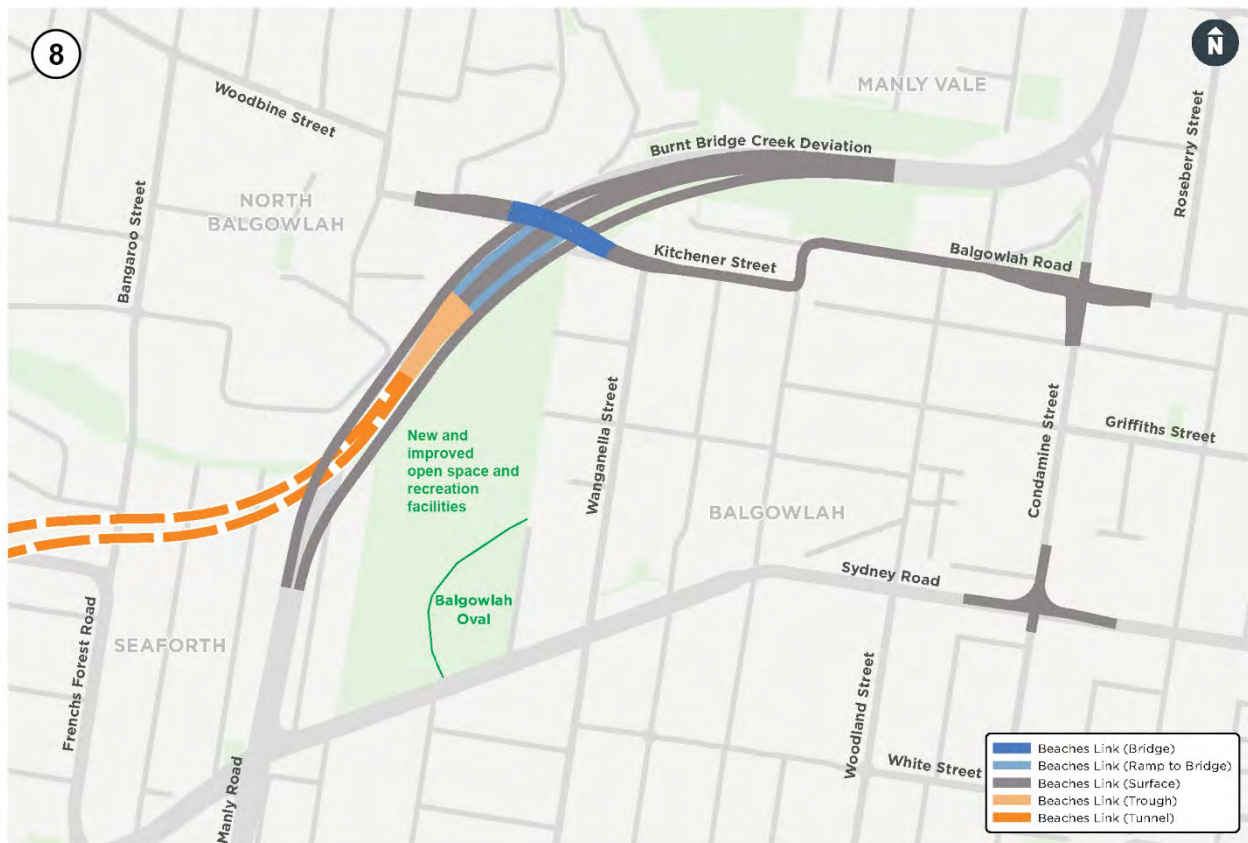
Alternative 8 - North facing tunnel ramps and surface ramps to Kitchener Street
